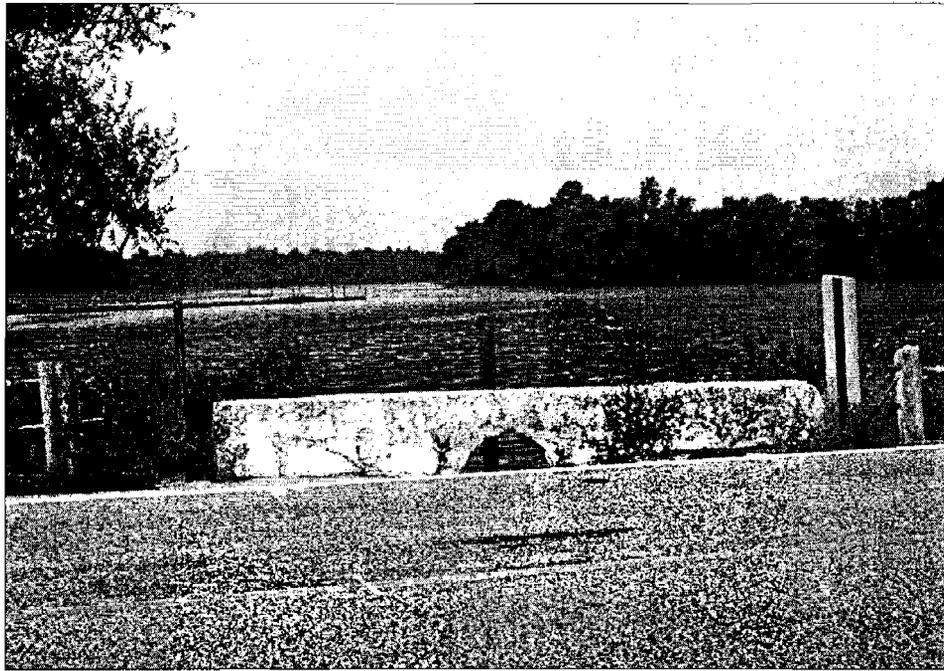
View of Bridge 3-918's Parapet Wall (West) at Reynolds Mill Pond (9/2002)
